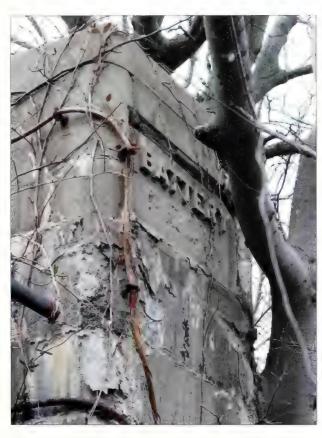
View looking northeast at corner of structure, Battery Peck. Efflorescence can be seen on many of the vertical surfaces and spalling is present on both horizontal and vertical surfaces indicating water has penetrated the concrete and is damaging the material (Olmsted Center, January 2009).
